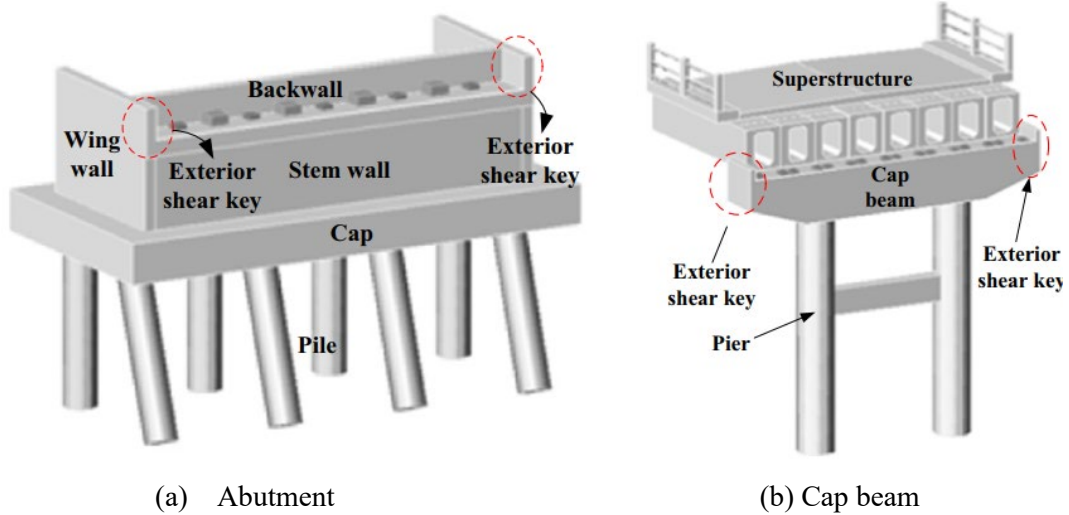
Exterior shear key located at (a) Abutment and (b) Cap beam (Han et al., 2017)
